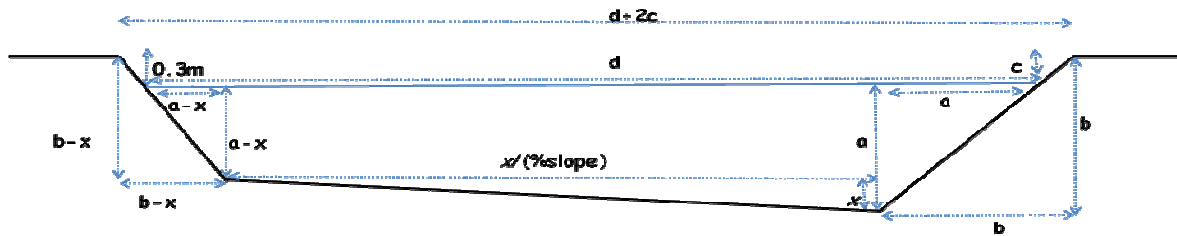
A cross section of a typical earthen fish pond showing the pond profile and important features
